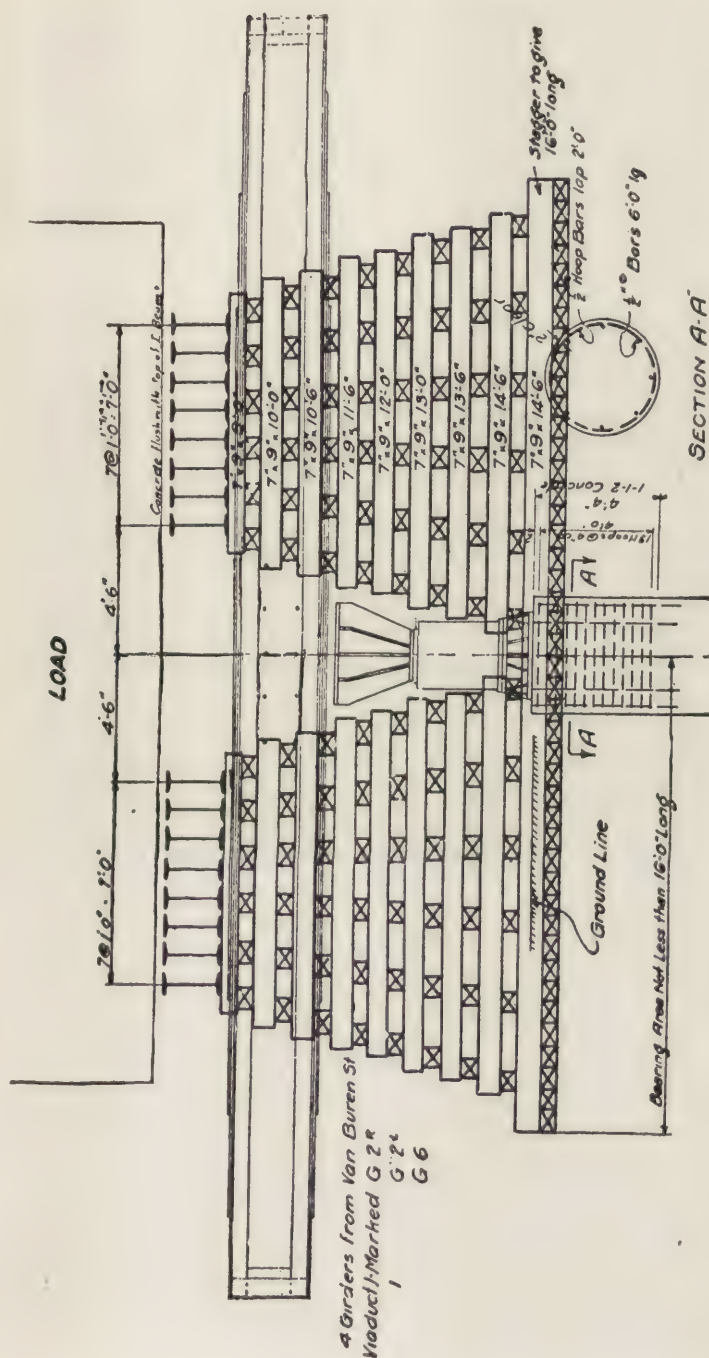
Elevation Showing Arrangement of Loads, Grillage and Hydraulic Jacks With Respect to Caisson to Be Tested. (Engineering and Contracting (Buildings), March 26, 1924, page 672.)
